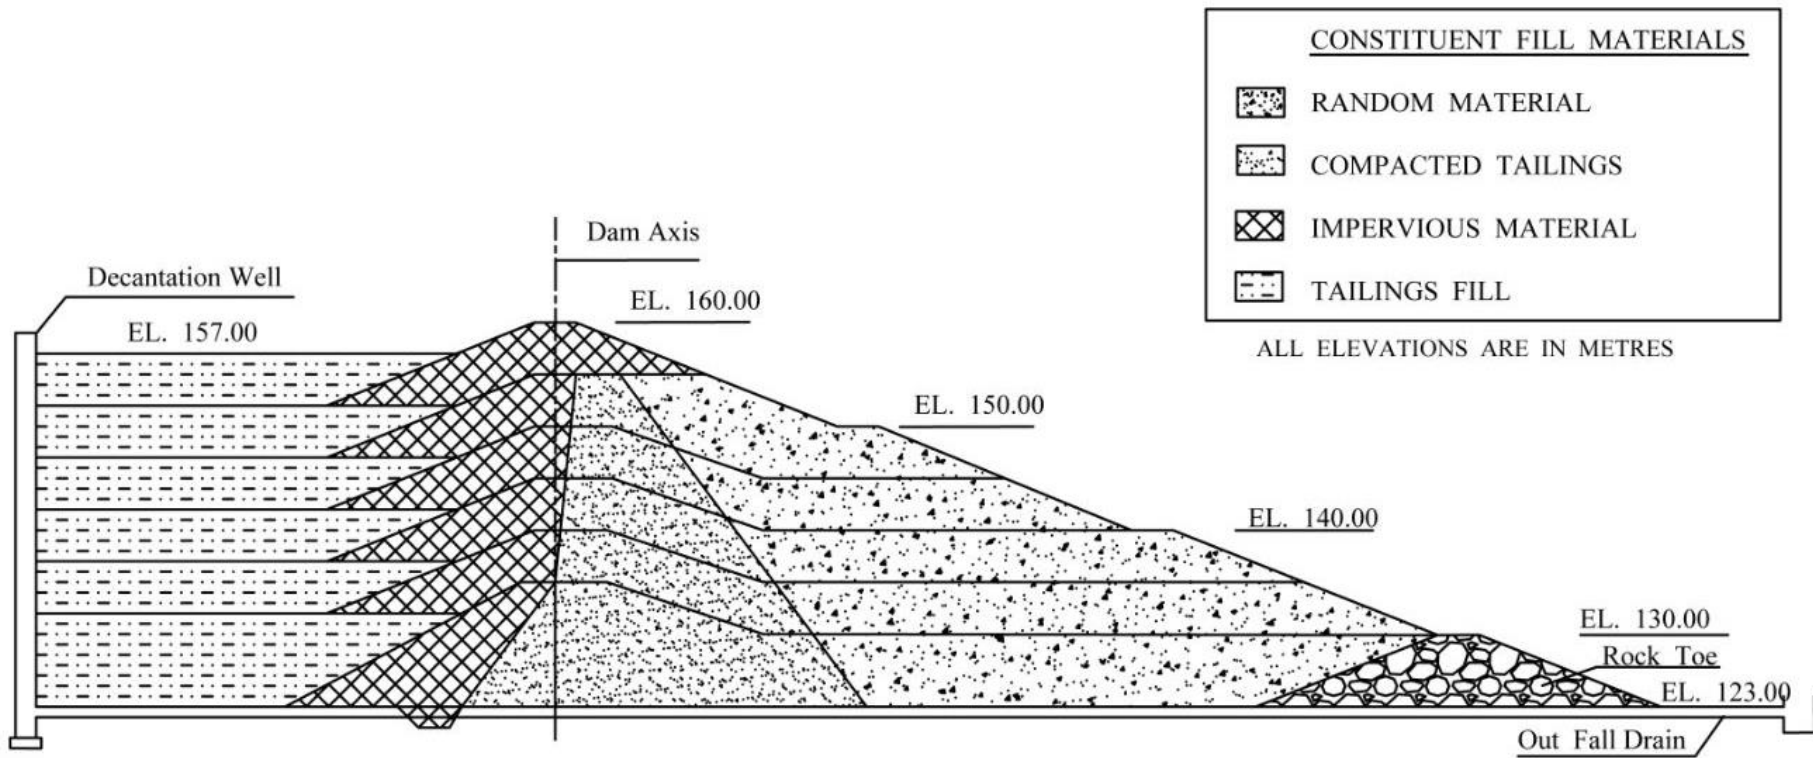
Cross section of the Jaduguda tailing dam showing construction materials
